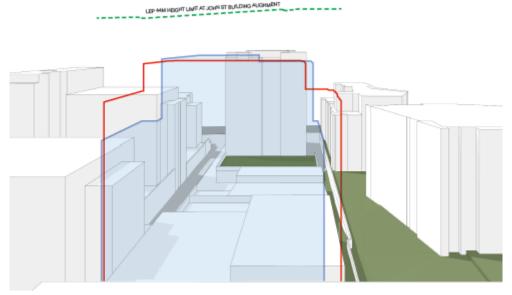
Expanse of building from Level 12 of 208-210 Coward Street
